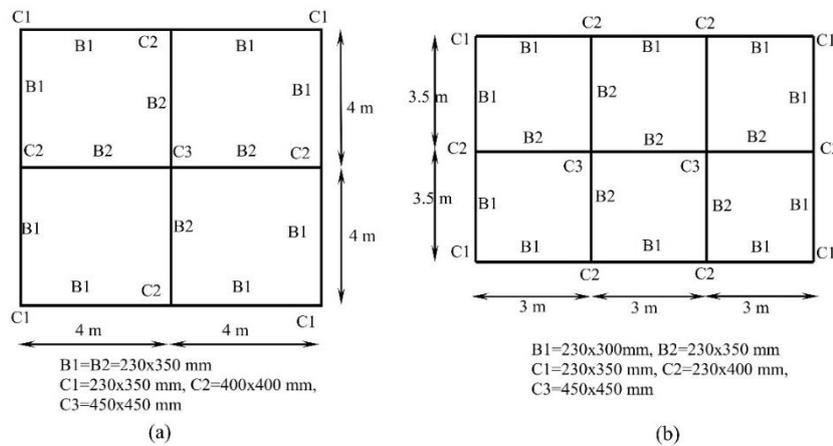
Plan of six storey building (a) square shape and (b) rectangular shape
